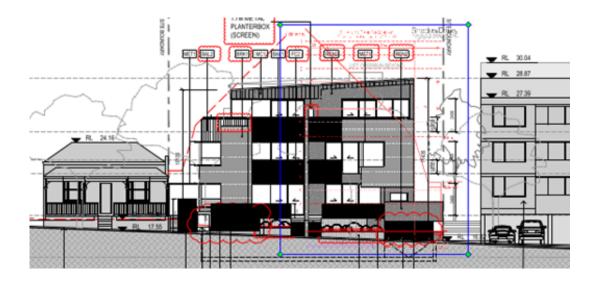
Encroachment of upper floor into required setback of B17 (Source: MGS Architects)
